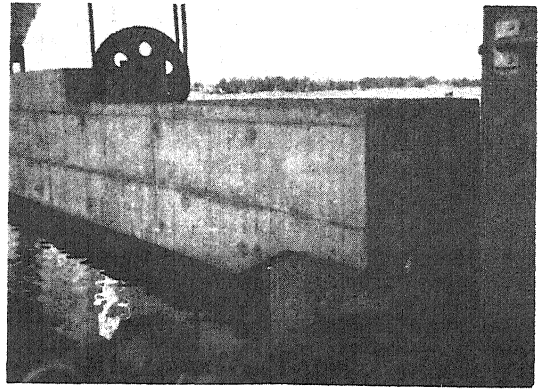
Collapse of the equilibrium Trap's beam due to the defects of mechanical and installed equipments in Sangar Control Dam.
